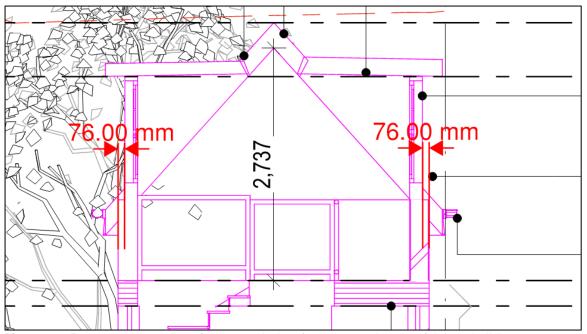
Proposed recessing of dormer window from external walls of the outbuilding.
